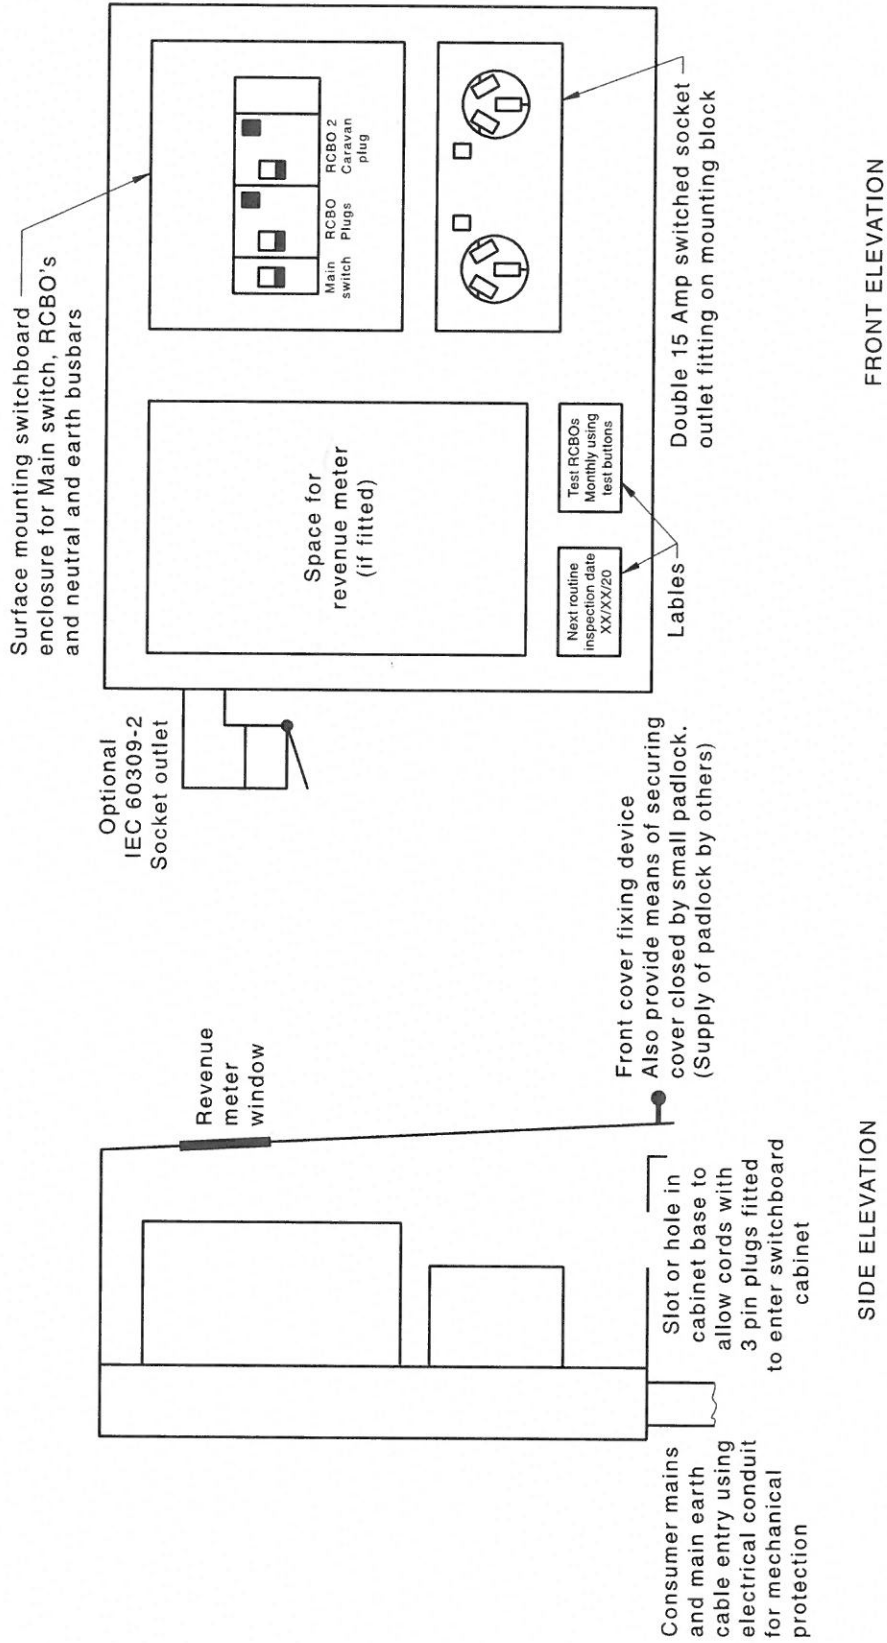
TYPICAL CONSTRUCTION SWITCHBOARD LAYOUT
